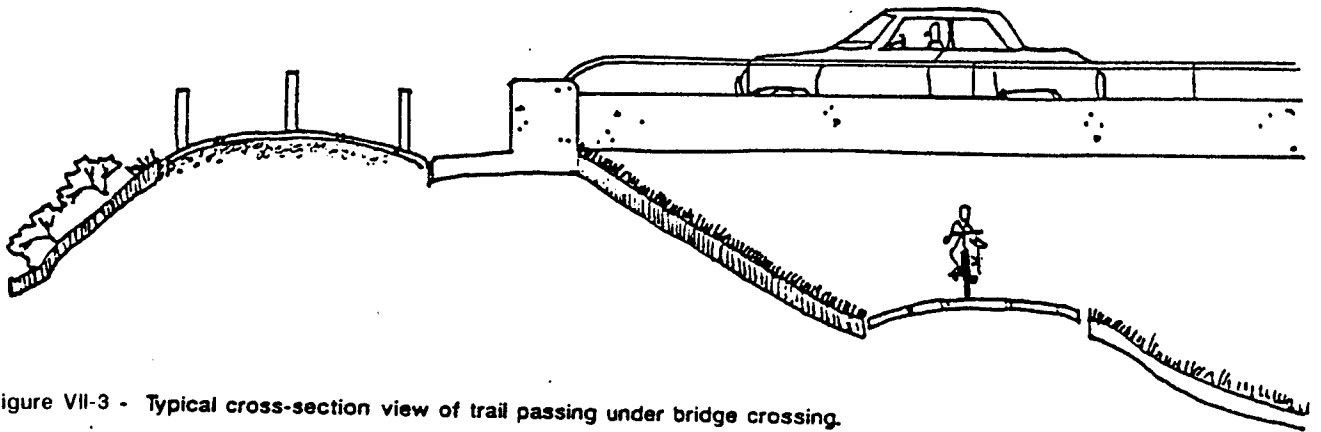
Typical cross-section view of trail passing under bridge crossing.
